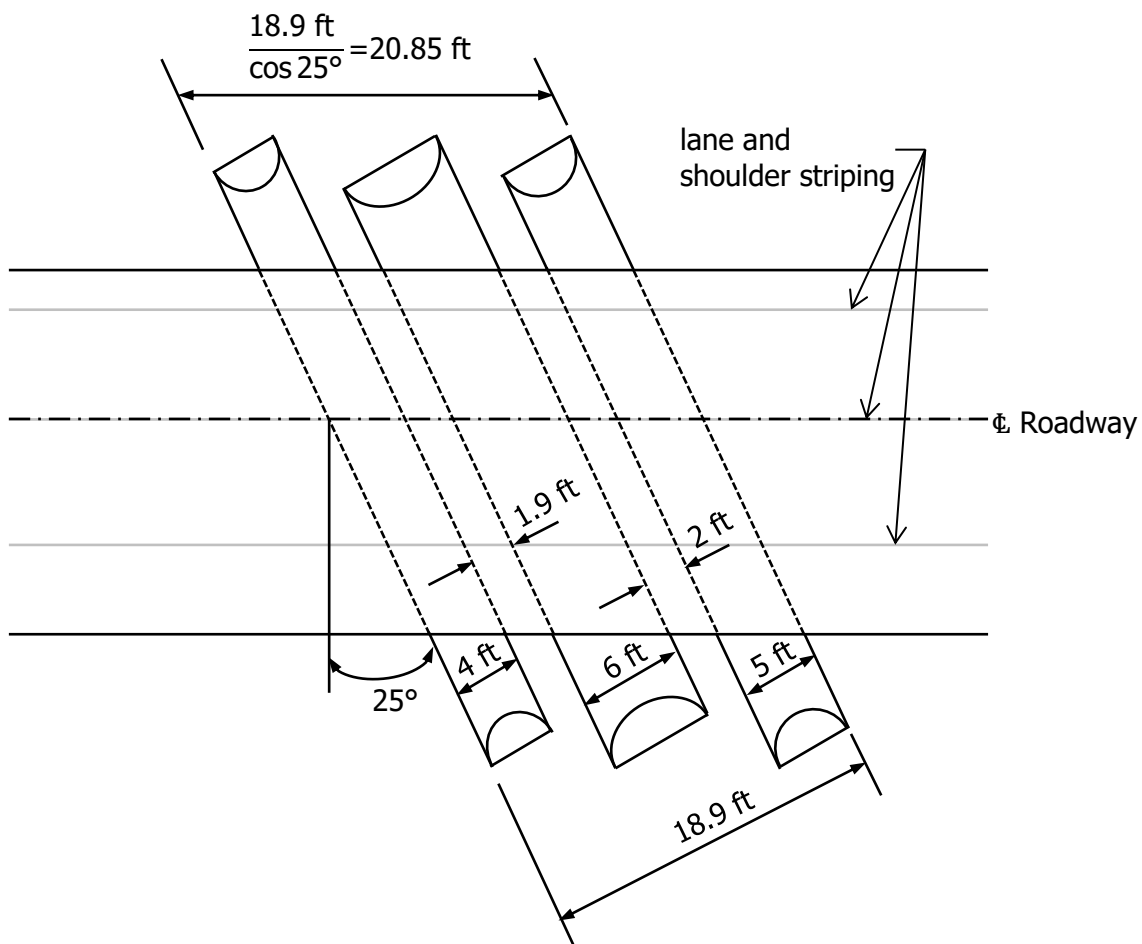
Plan view of a skewed, multi-pipe bridge under fill, or culvert under fill.
